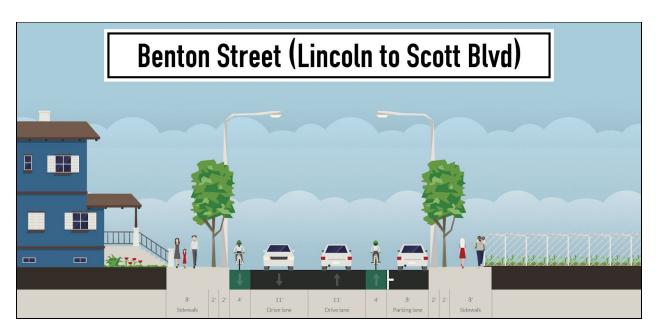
Cross-section of Final Design for Benton Street (Lincoln to Scott)
